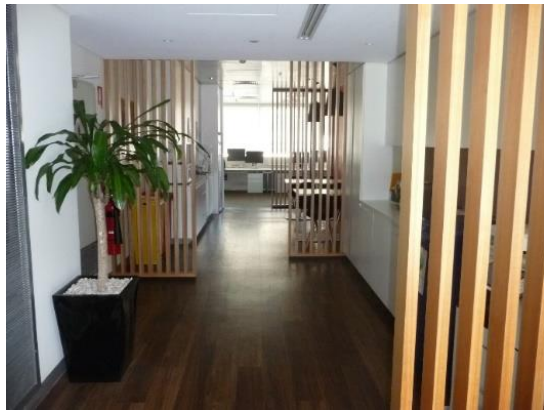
Typical finishes to the office area located at the western section of Level 20.
